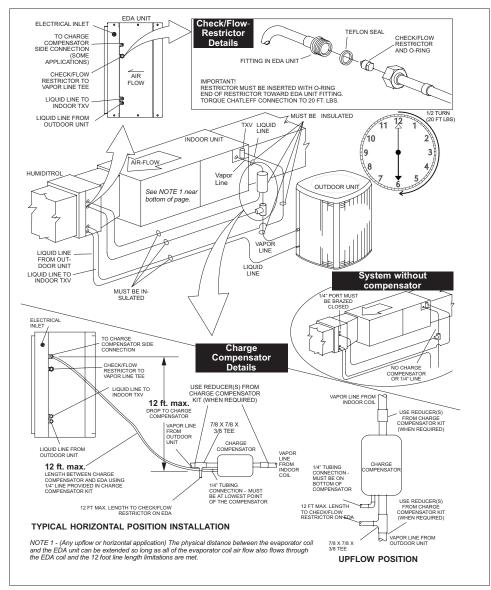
Typical Installation (Horizontal Air Handler Shown)
